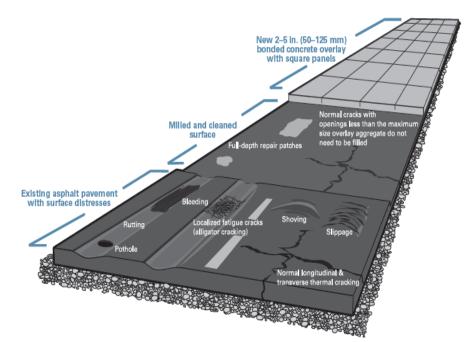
Notable distress on existing pavement and possible repairs for bonded whitetoppings [4]
